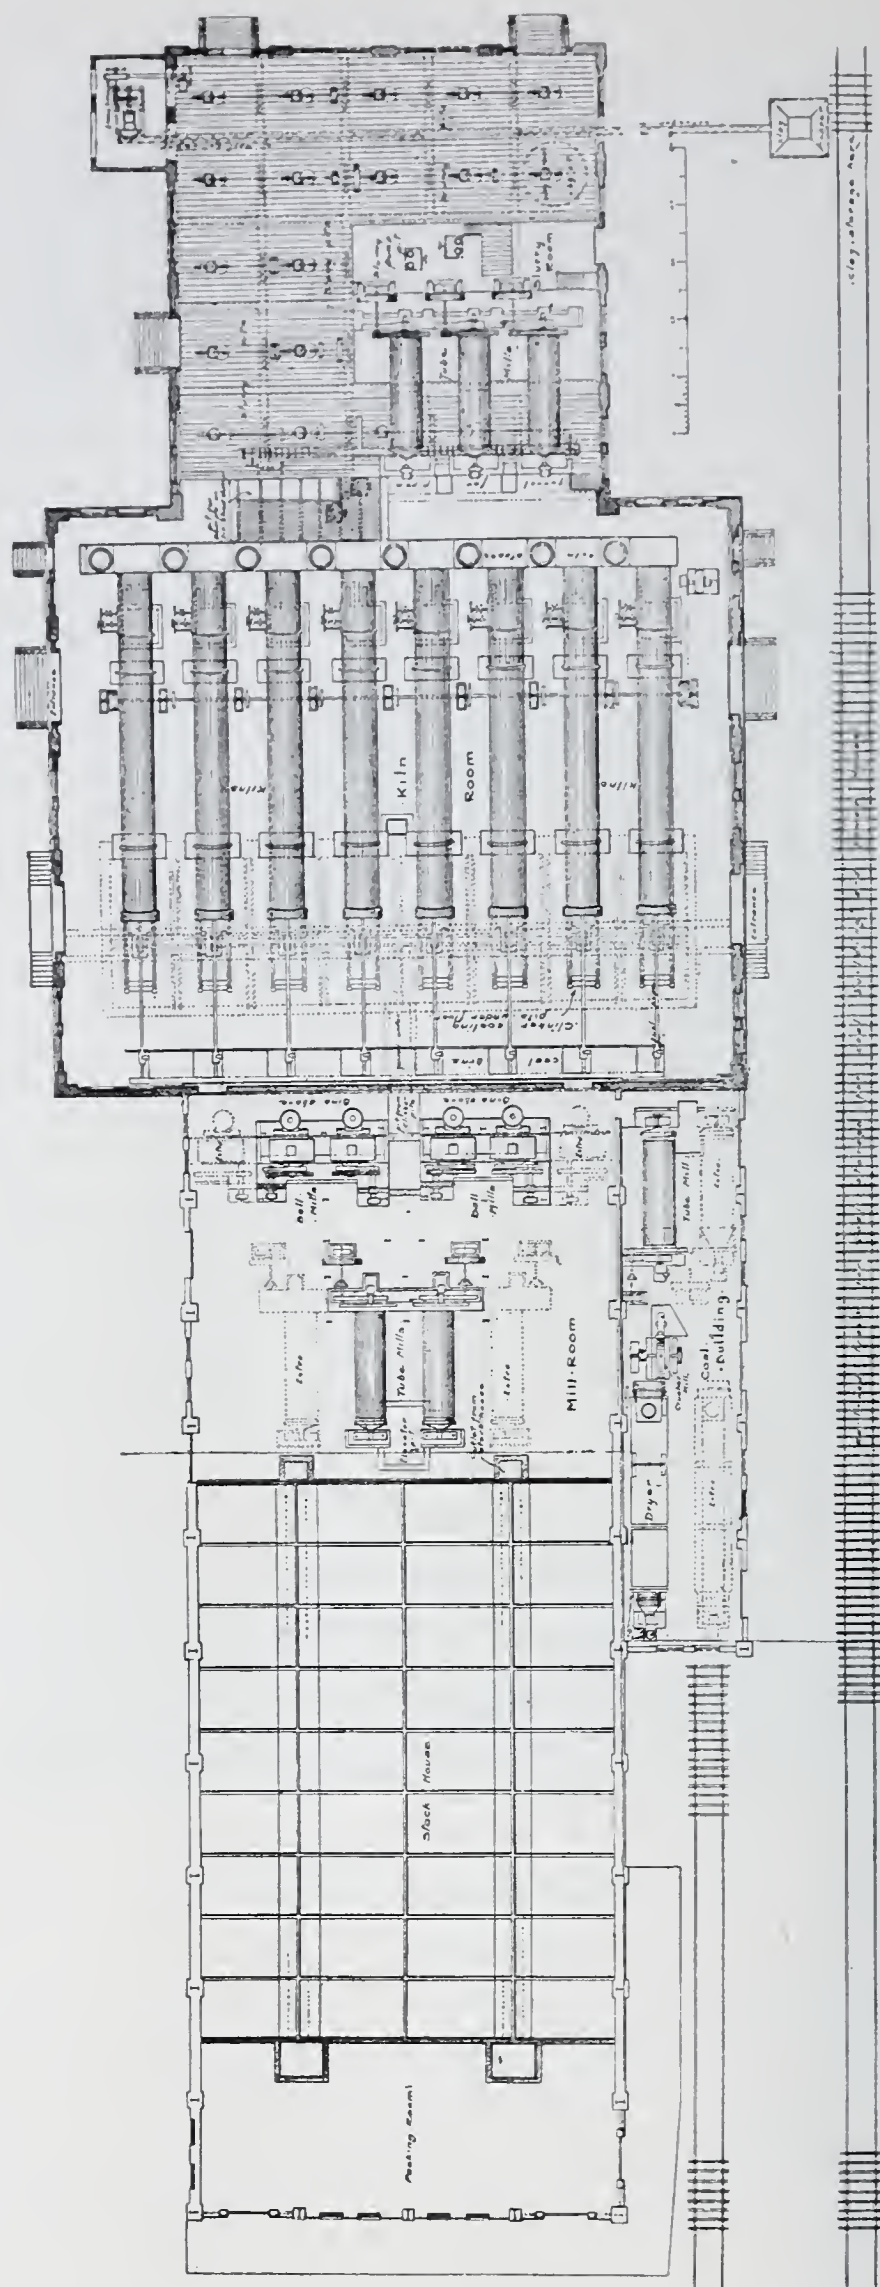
GROUND PLAN OF MILL BUILDINGS.
